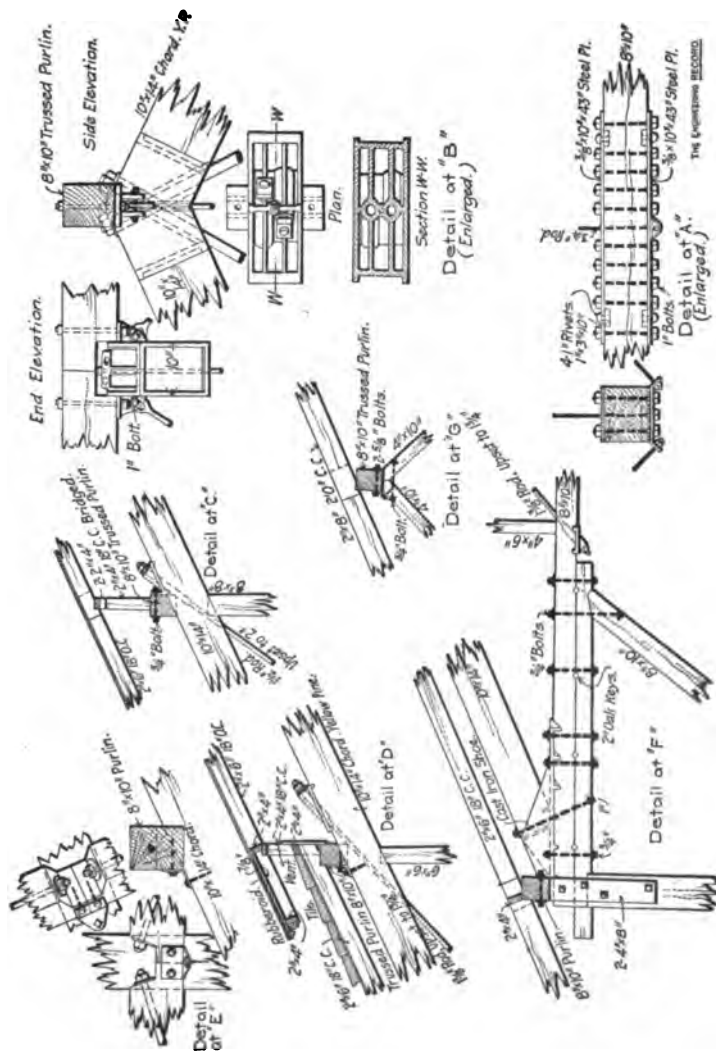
Details of Roof Truss of Forestry Building, Pan-American Exposition.
